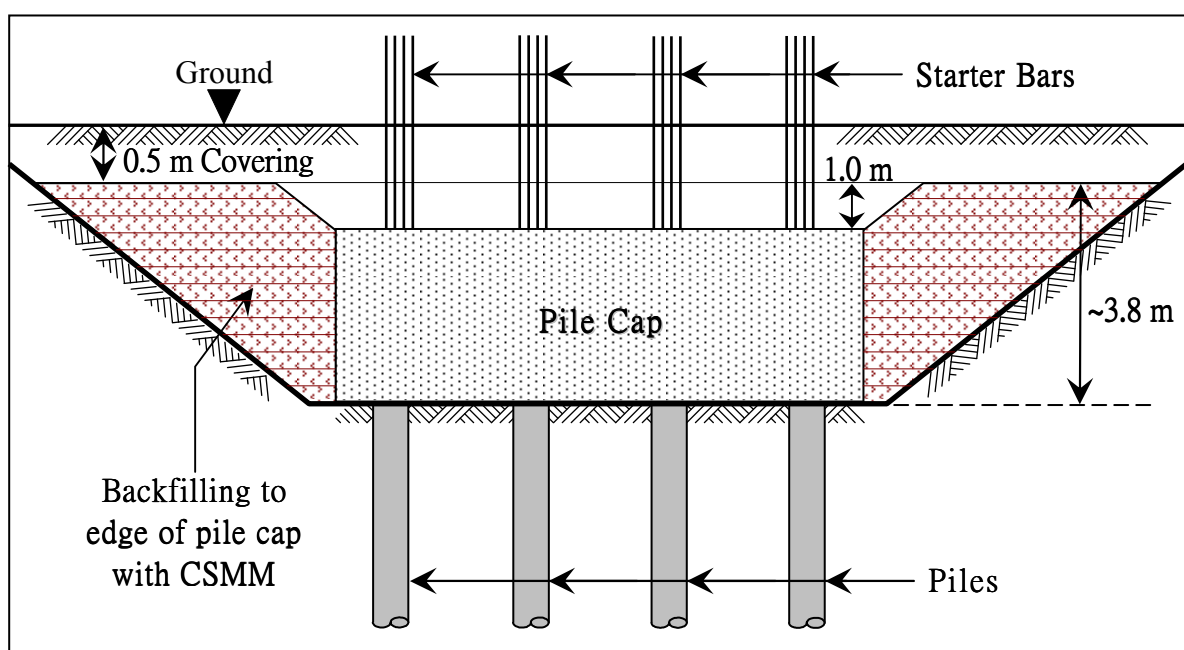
Typical Profile for Use of CSMM in Backfilling around Pile Caps
